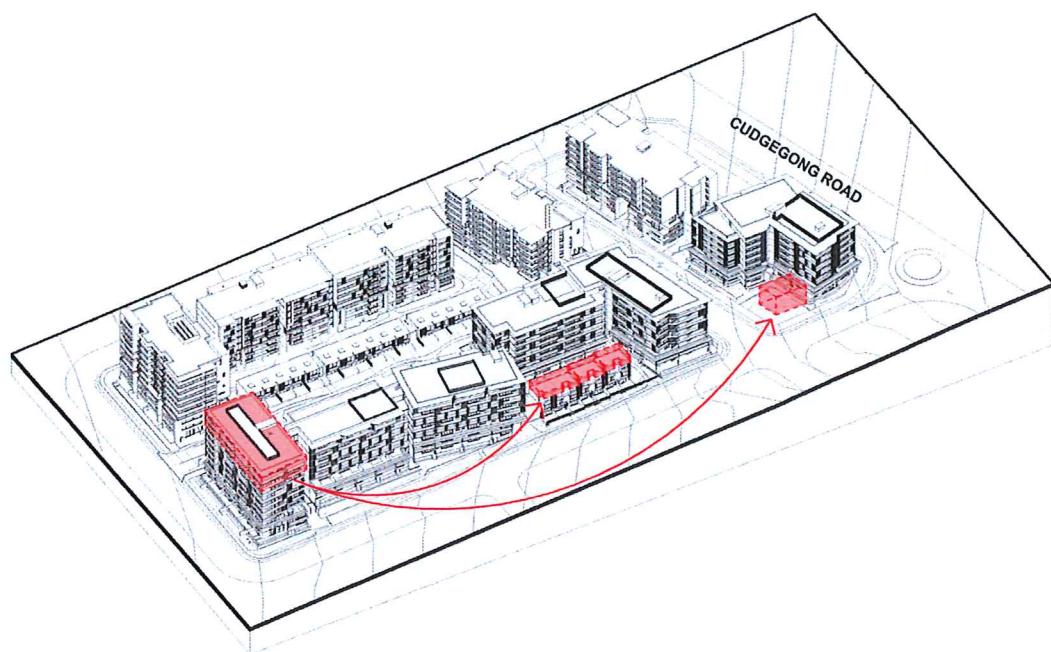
Massing model for 56 Cudgegong Road (the northern site) of the proposed development, demonstrating that the 2 additional storeys (consisting of 10 apartments) to the Building E (left of the image) have been redistributed/reallocated from the centrally located 3 storey Building B2 elements and the communal open space area of Building A (right of the image).
